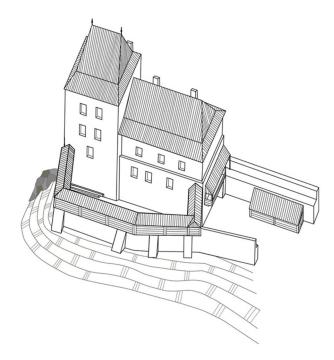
Reconstruction of the building forms of Vassal House in Křivoklát Castle. Prepared J. Hložek.
